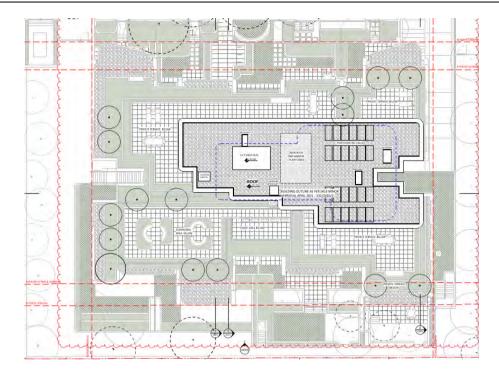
DA232/2020/3 s4.55(2) modification amended proposed roof plan (subject of this report) with two units on level 3
